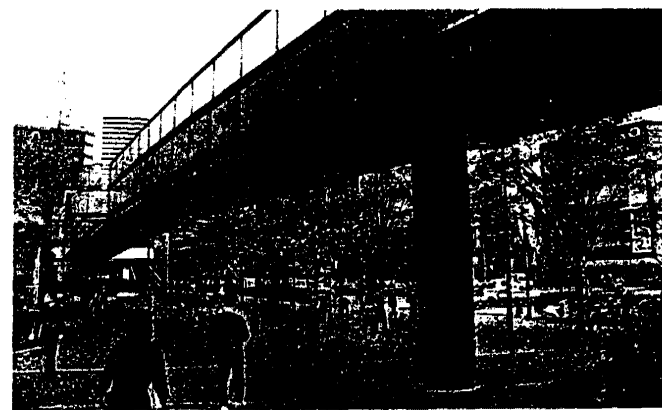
Pedestrian bridge connecting decks in Umeda Redevelopment District, Osaka, Japan.
